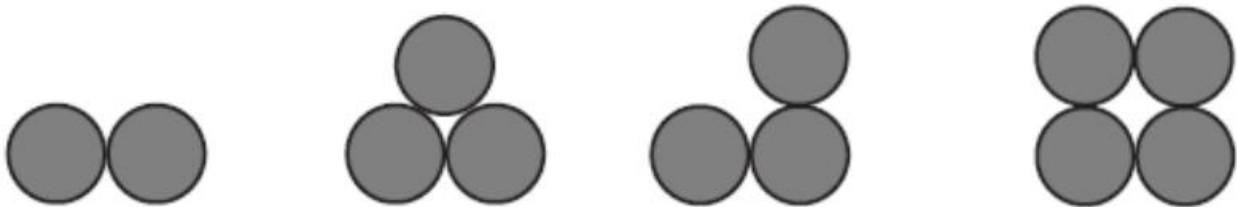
Possible Reinforcing Bars Bundling Schemes
